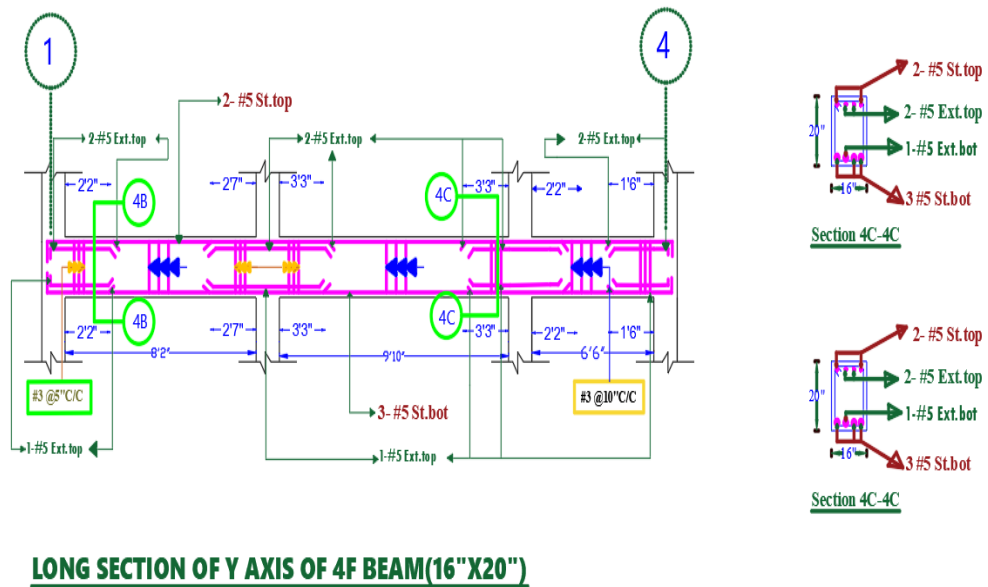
Long and Cross Sections of Y Axis of 4<sup>TH</sup> Floor Beam (16" X 20")
